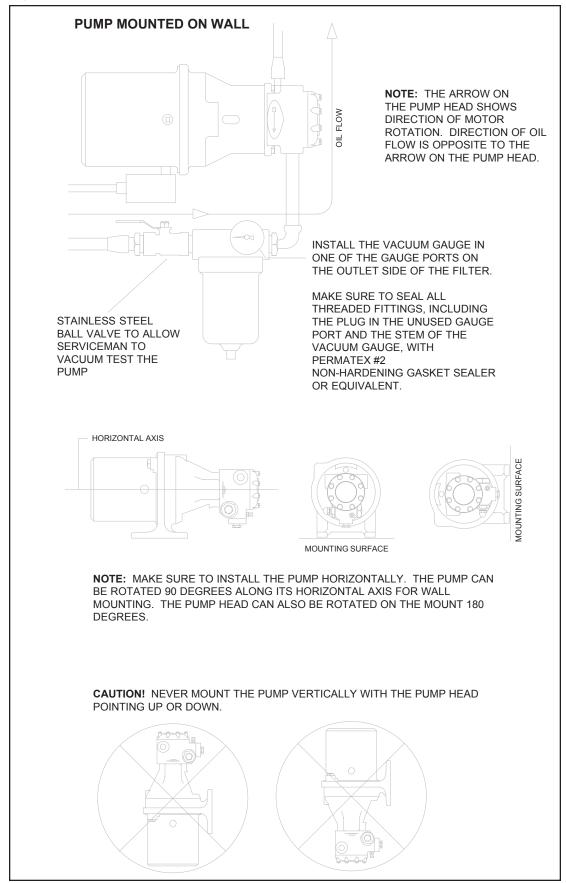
H - Detail of Pump Installation for Above Ground Inside/Outside Tank
